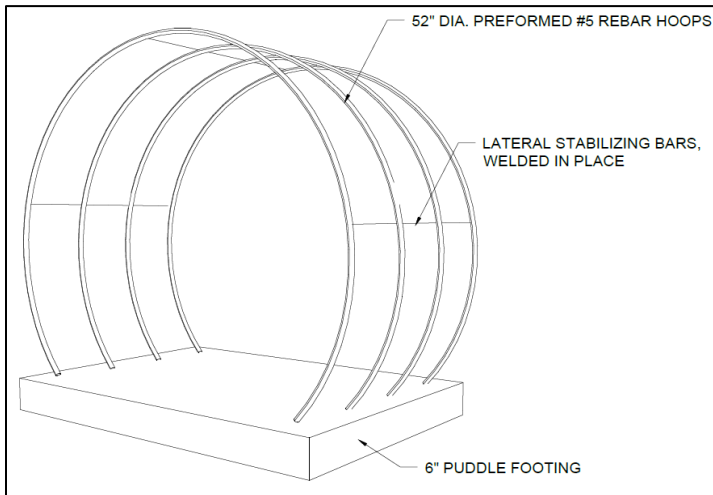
Perspective Rendering of Child Scale Entry Tunnel
